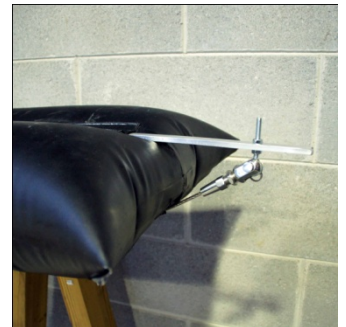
CONNECTION UPPER STRUT AND LOWER CABLE
